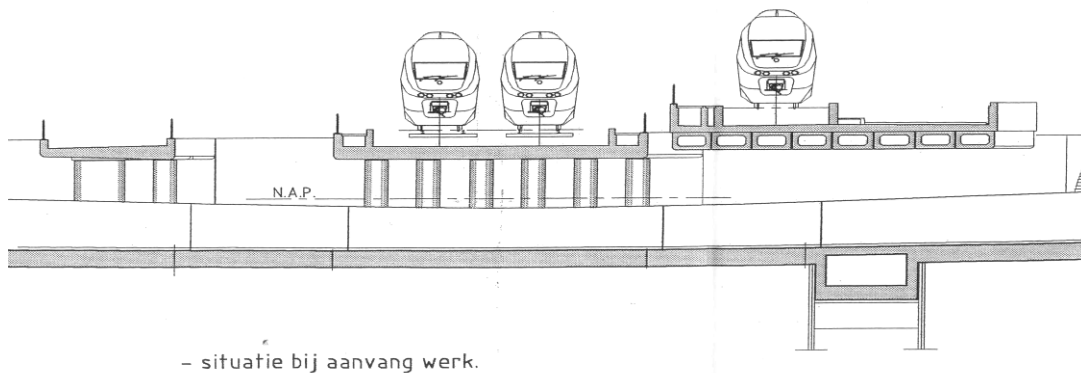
A cross-section view of the underpass (current situation), (ProRail, 2006)
